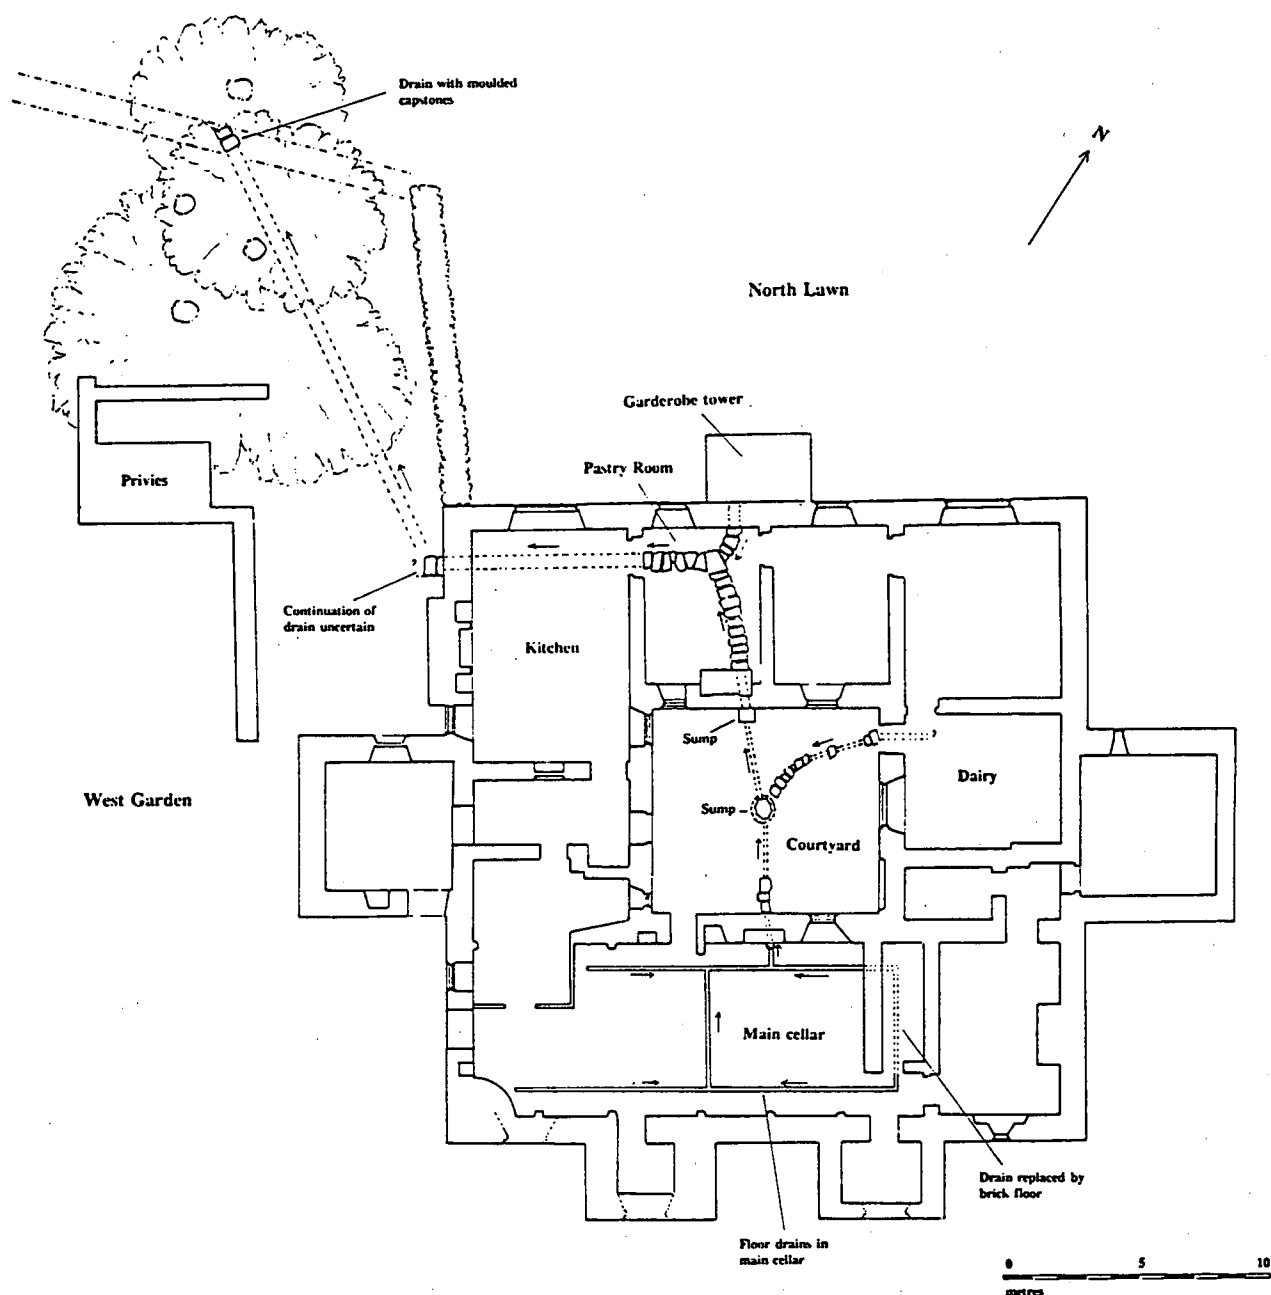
Plan of the basement of Chastleton House showing the configuration of drains.
